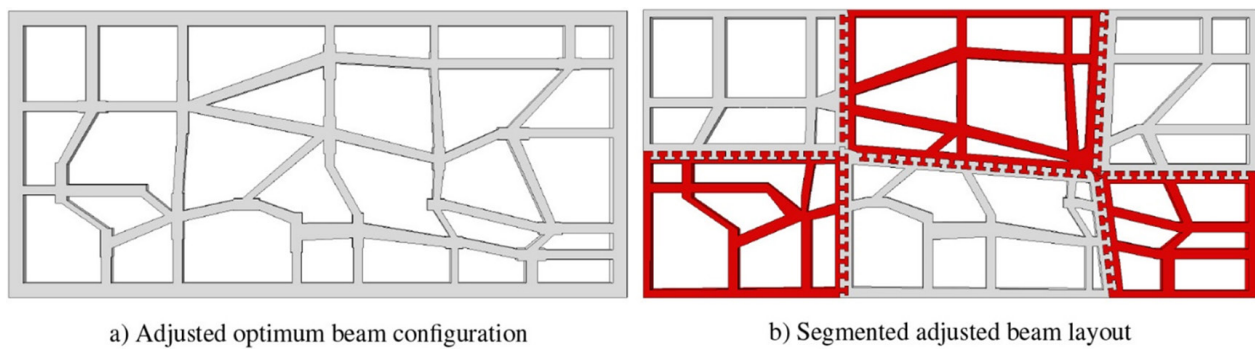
AI-assisted segmentation design for prefabricated wall-floor building by Baghdadi et. al [77].
